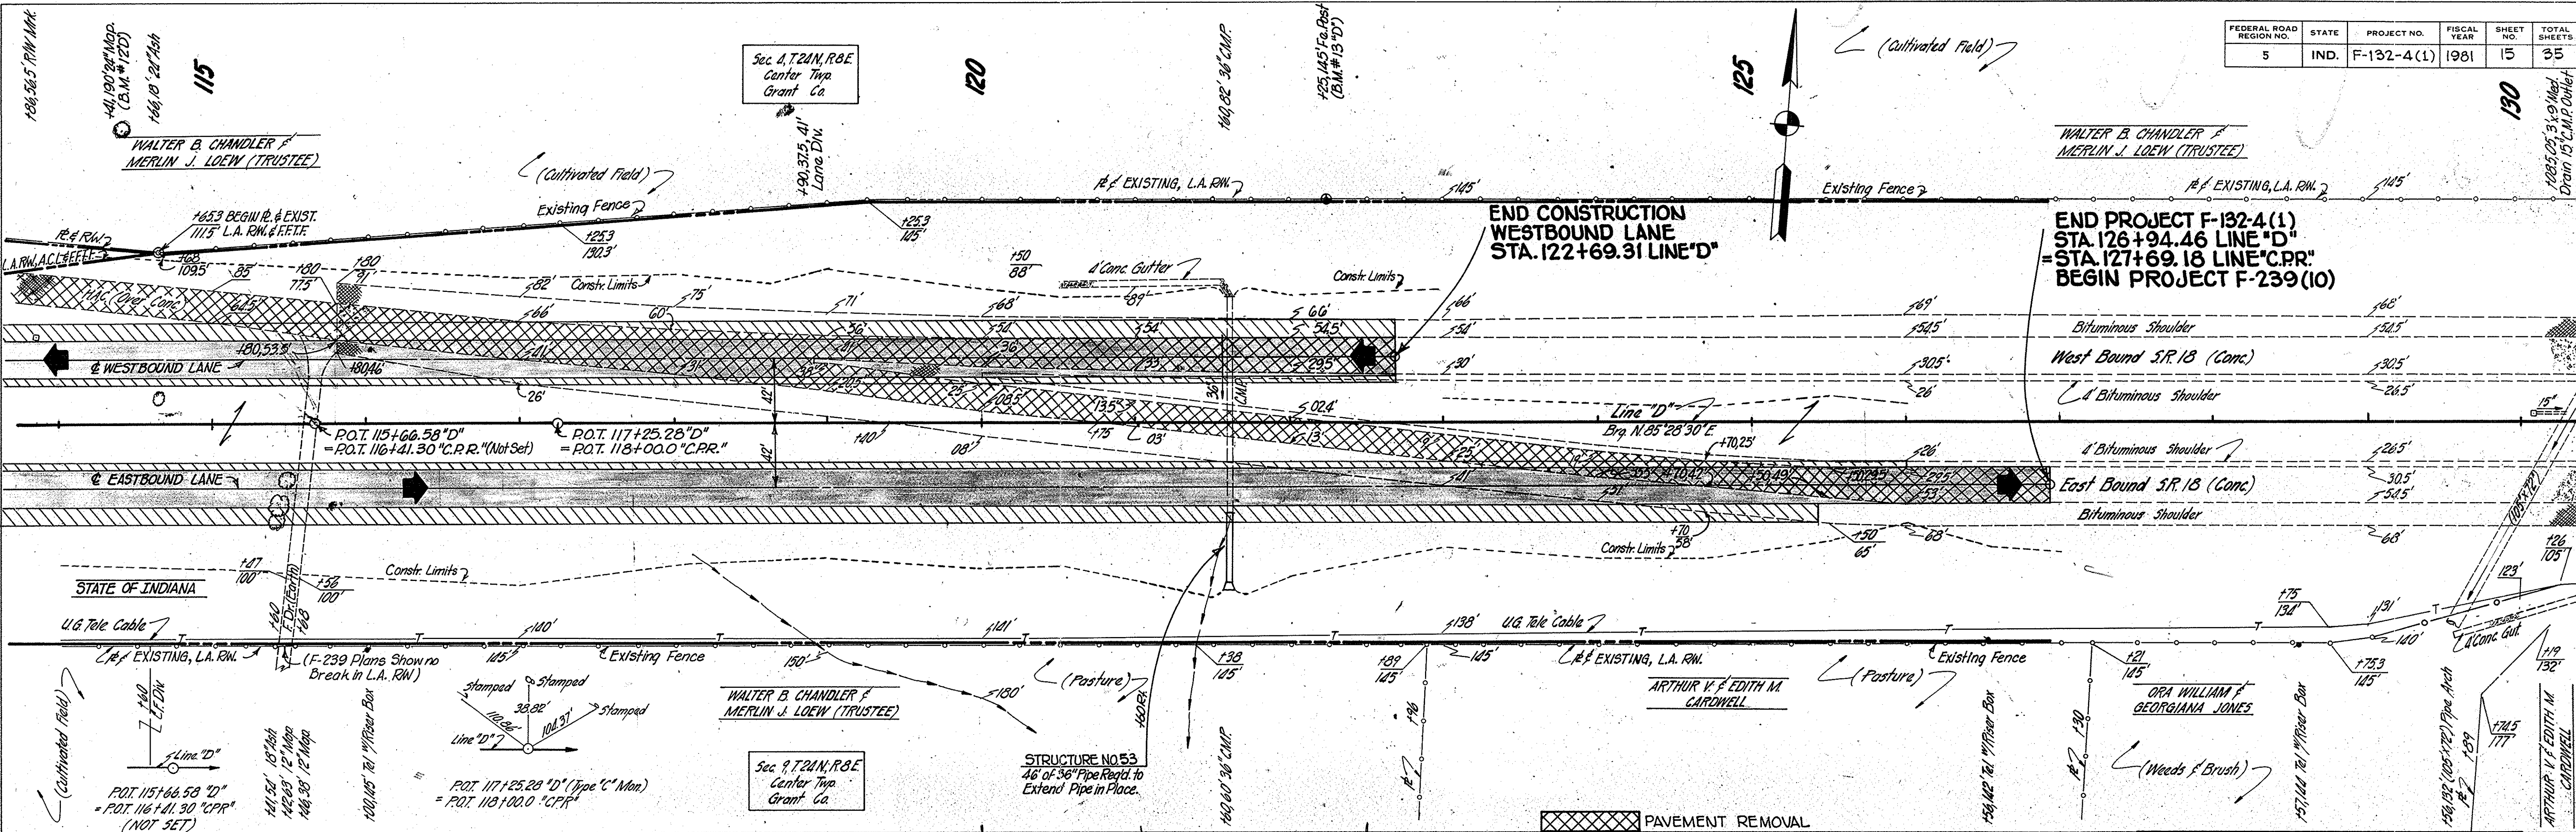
PLAN - PROFILE S. R. R. STANDARD
